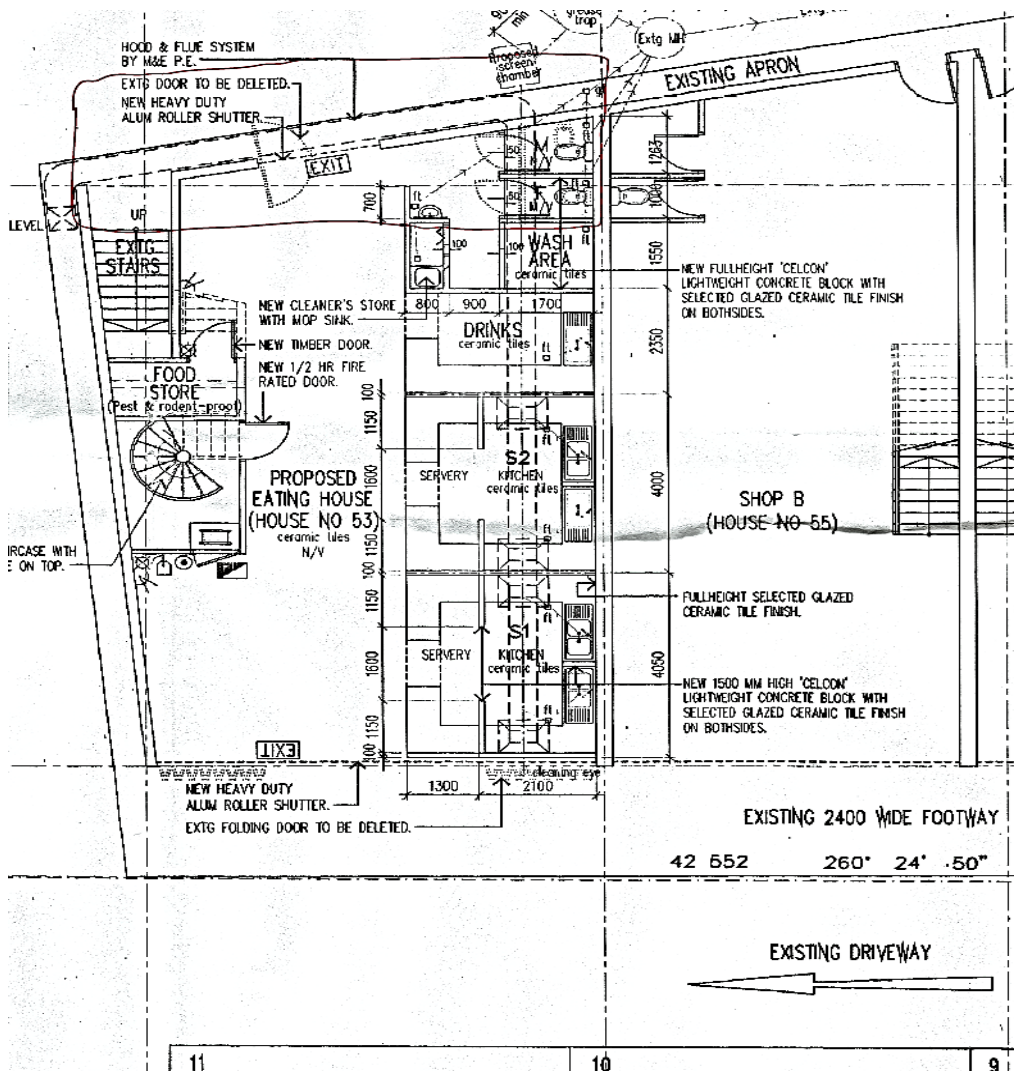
Sketch plan for renovation of the ground floor of Unit 53
